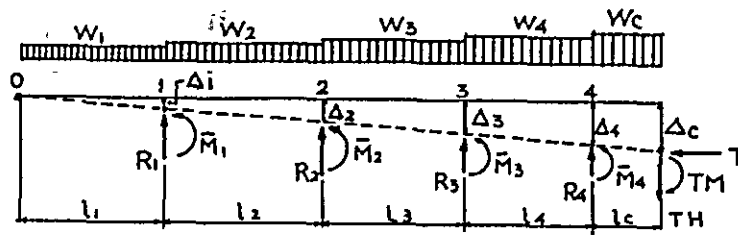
FOUR-SPAN TOWER WITH CANTILEVER
